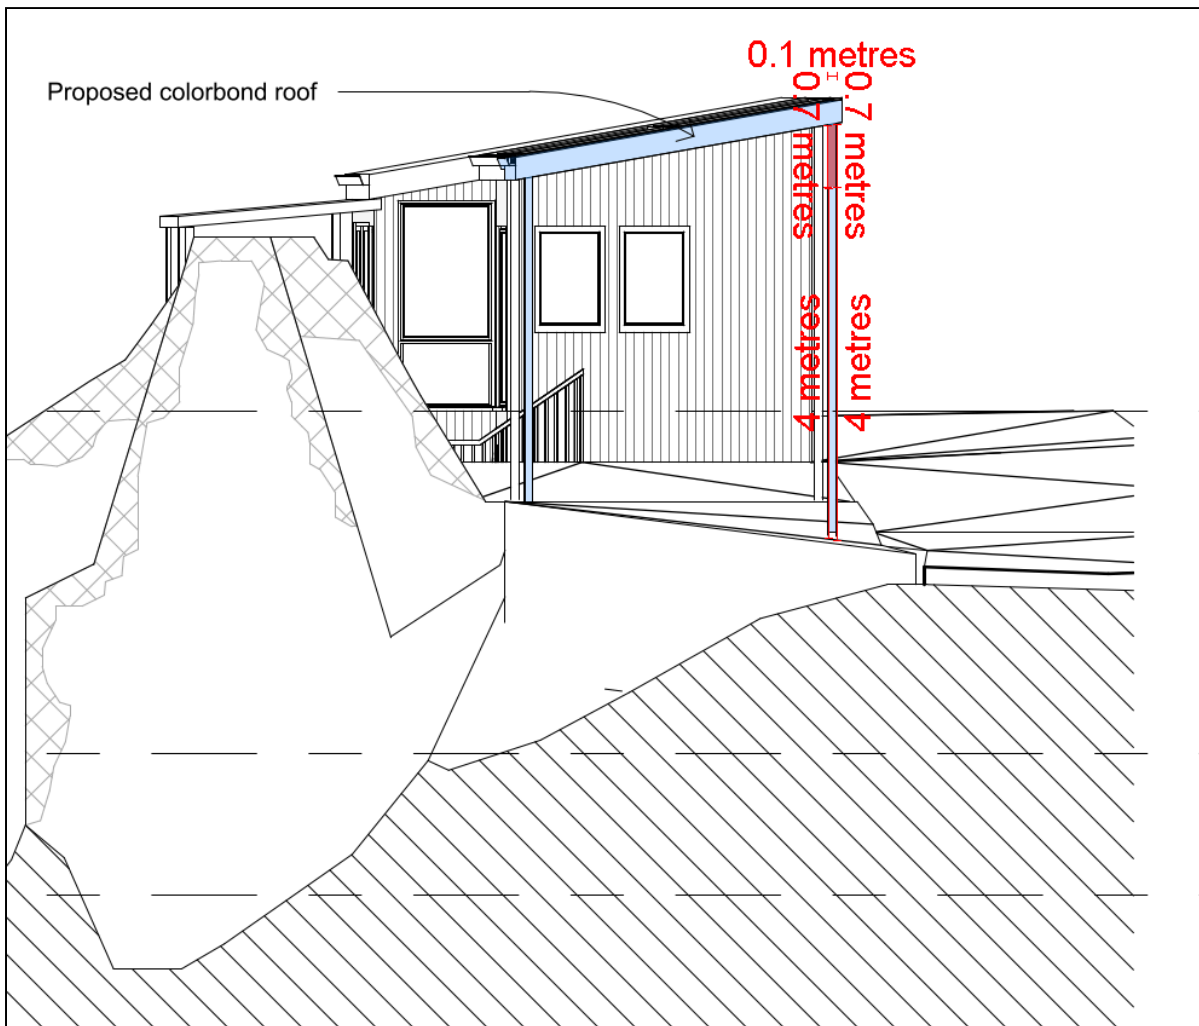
South West Elevation (red highlighting building envelope numerical non-compliance)
